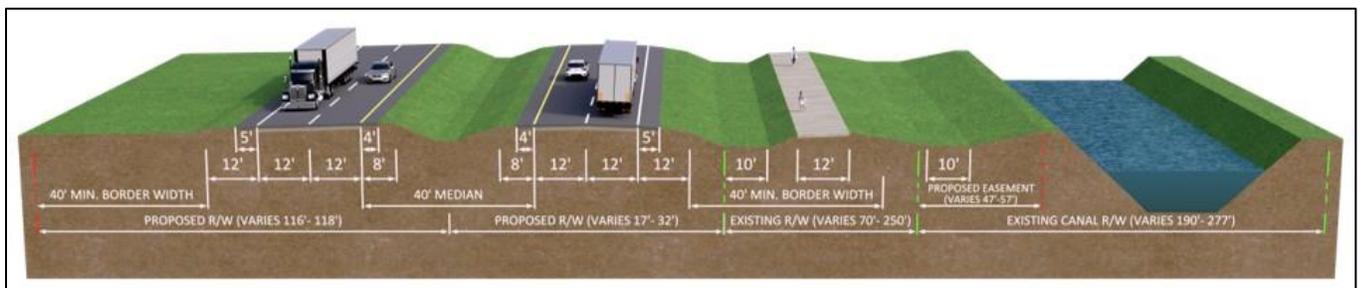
| Preferred Alternative Roadway Typical Section: West of Harney Pond Canal C-41 and East of Indian Prairie Canal C-40
